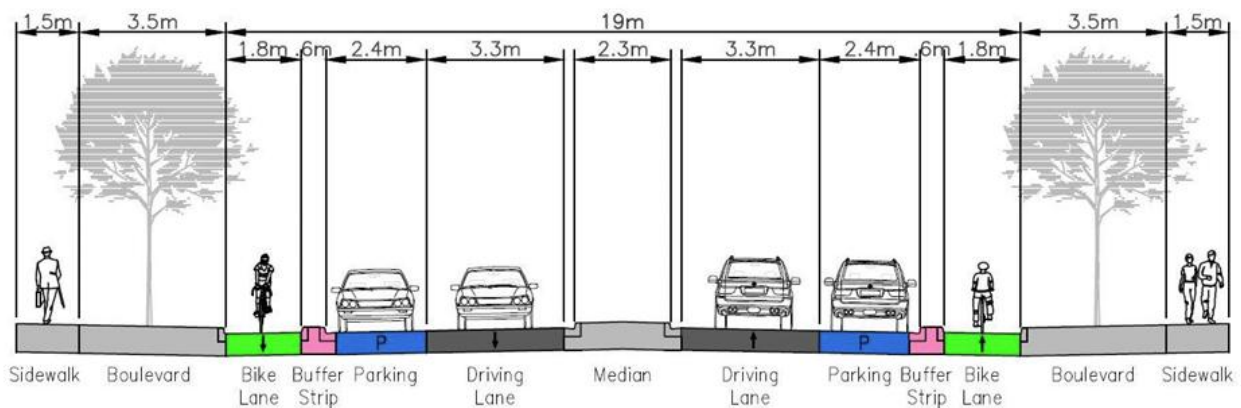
Approved Design for Victoria Avenue from Taylor Street East to 7th Street East - Protected Street-Level Bike Lanes with Parking
